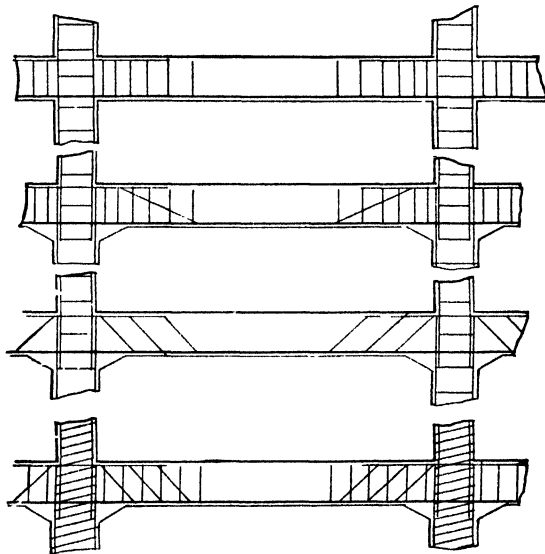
Reinforcement of a Continuous Beam. (See p. 522.)
